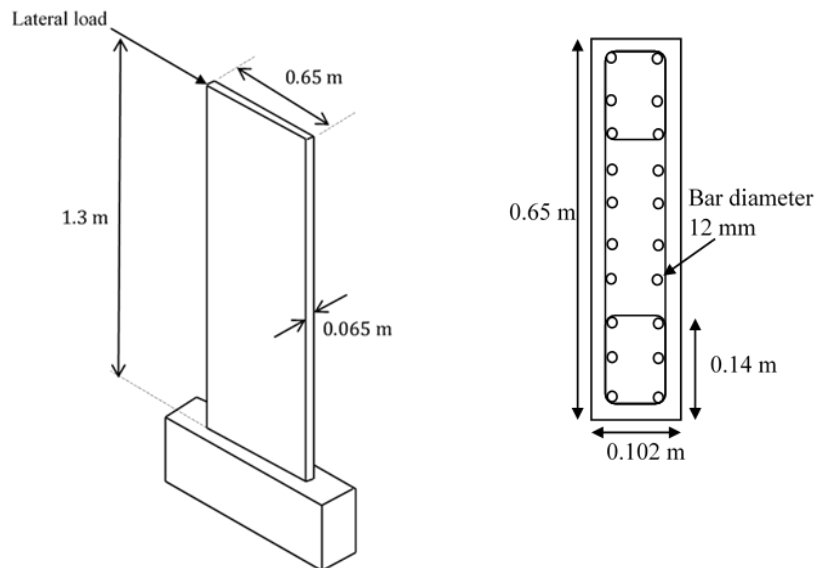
Loading arrangement, dimensions and reinforcement details of SW21
